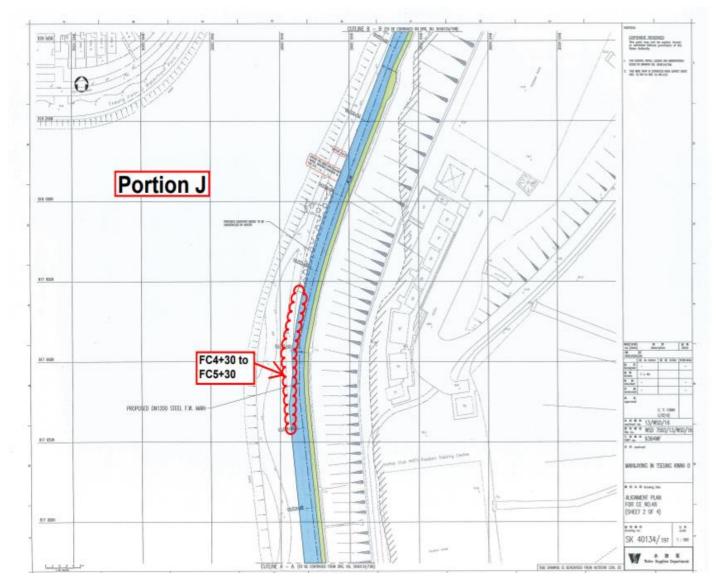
Location Plan for Portion J – Landfill Stage 1 (FC4+30-FC5+30)
